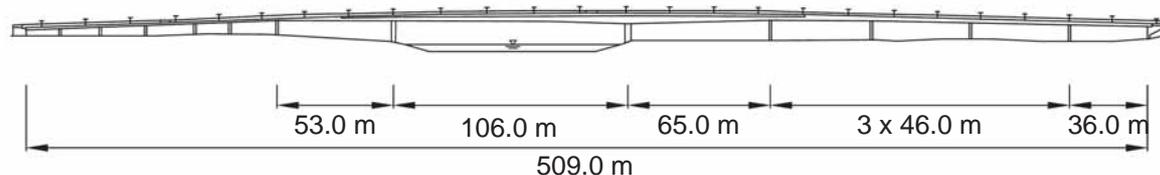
Elevation of the Elbe river bridge Torgau, Germany, 1993.
